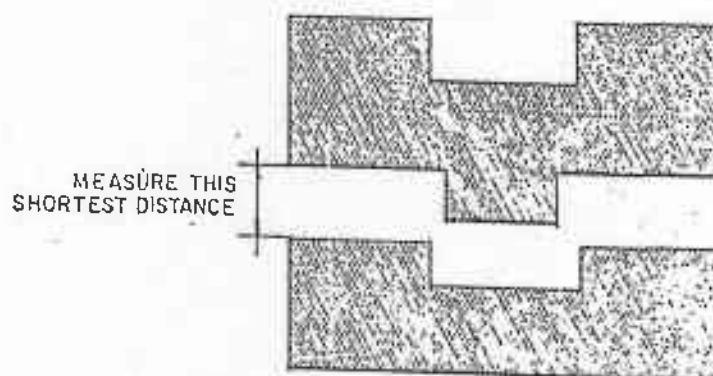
MEASUREMENT OF DISTANCE BETWEEN BUILDINGS
